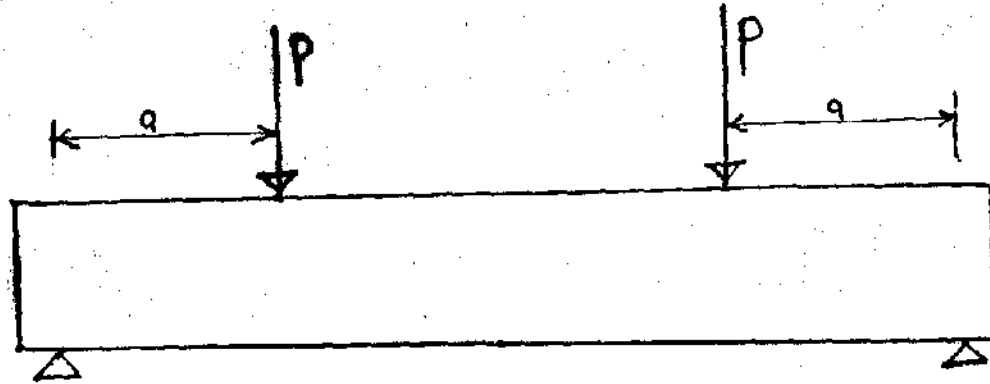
Arrangement for Investigating Shear Failure.
